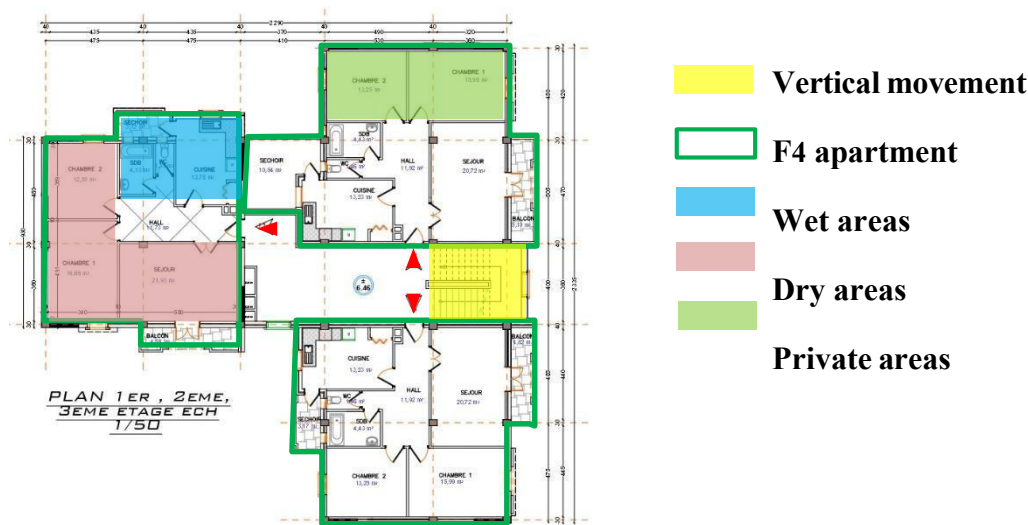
Typical Floor Plan of Corner Block (Source: design office Nebar Omar +Author treatment , 2025).
